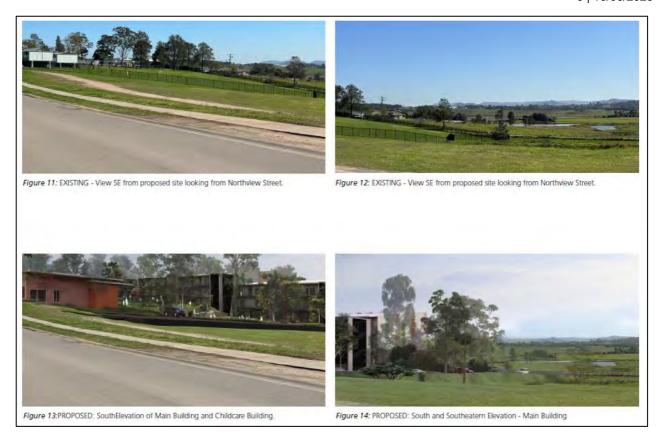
Viewpoint 1 Northview Street- High Impact (Source: SHAC, 2024)
